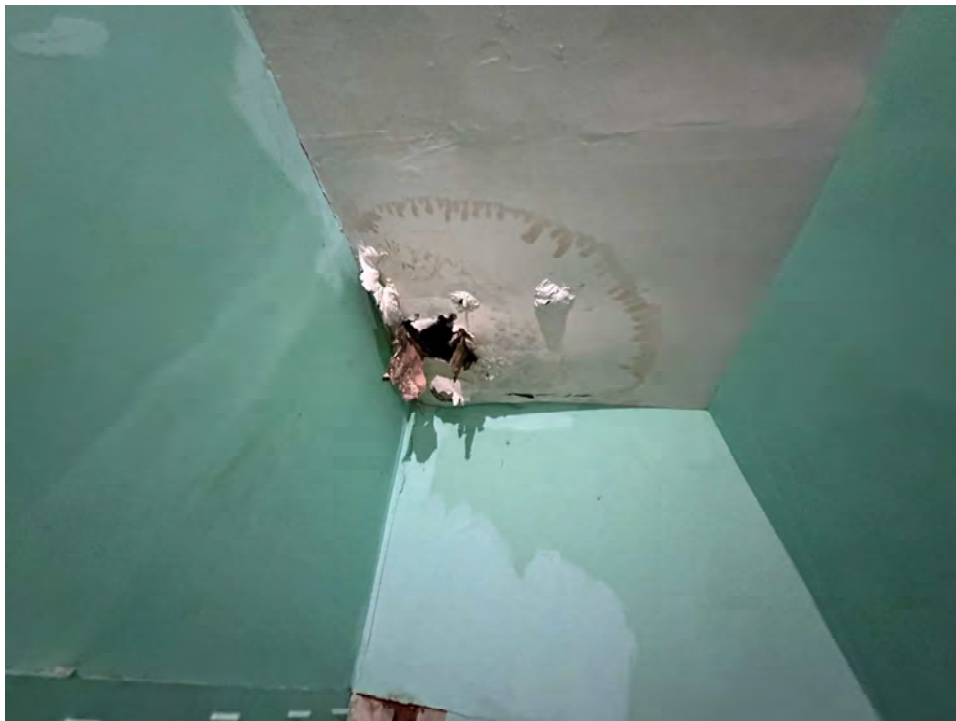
Deterioration from moisture ingress on third floor unoccupied space
